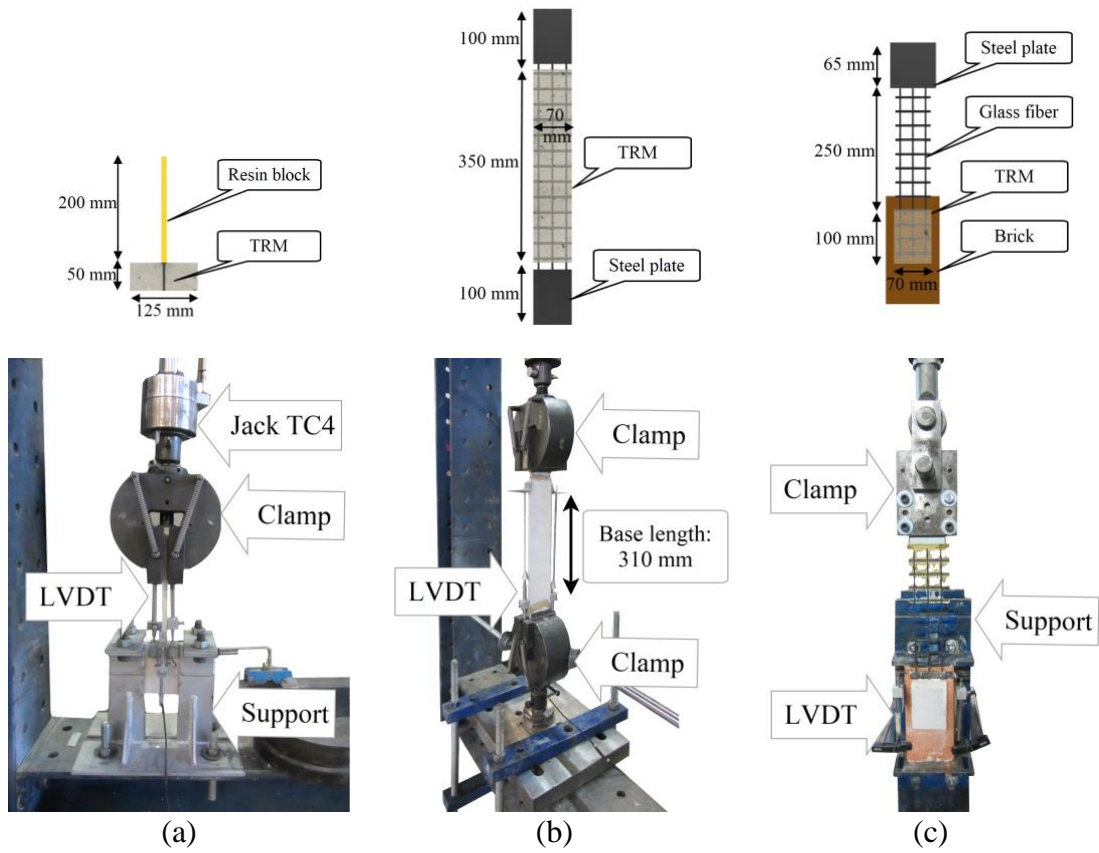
Geometrical details and test setups: (a) pull-out test; (b) tensile test; (c) single-lap shear test.
